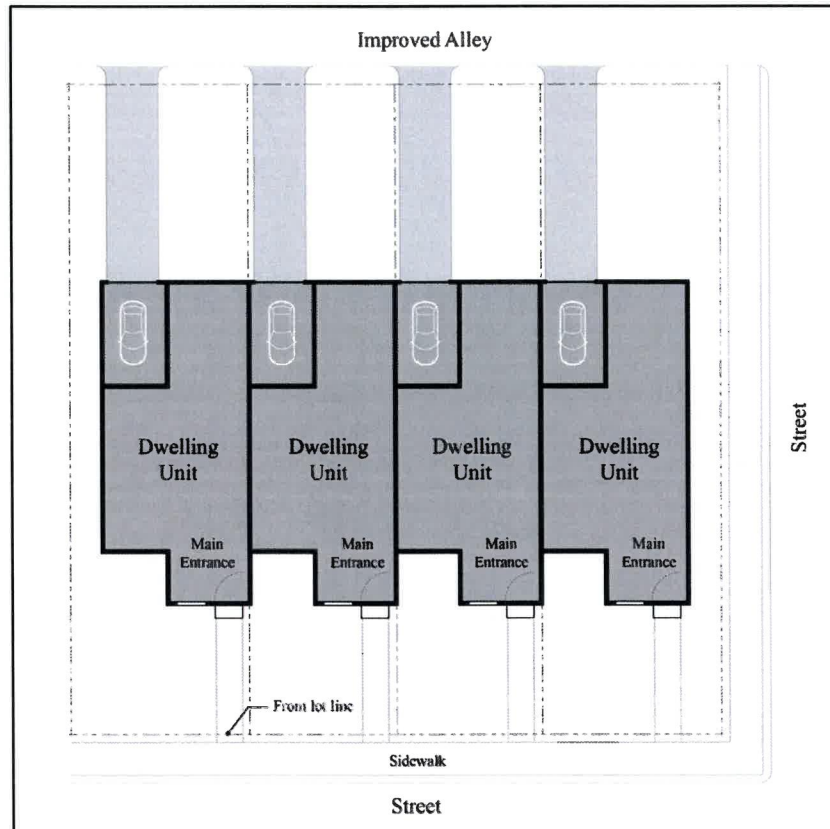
Triplex, Fourplex, and Townhouse: Alley Access Example
